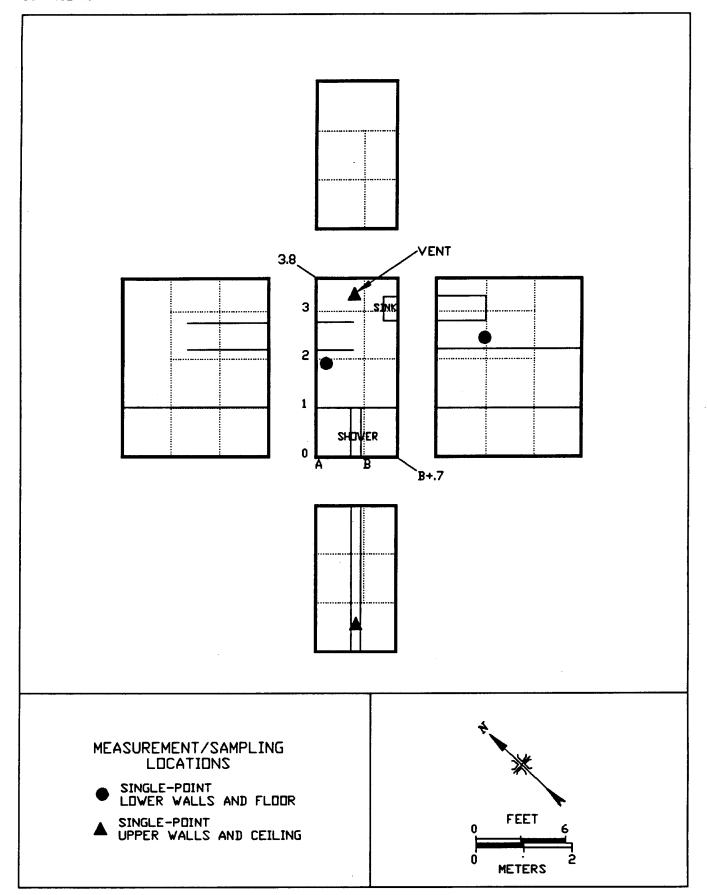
Building 005, Room 107A&B - Measurement and Sampling Locations
